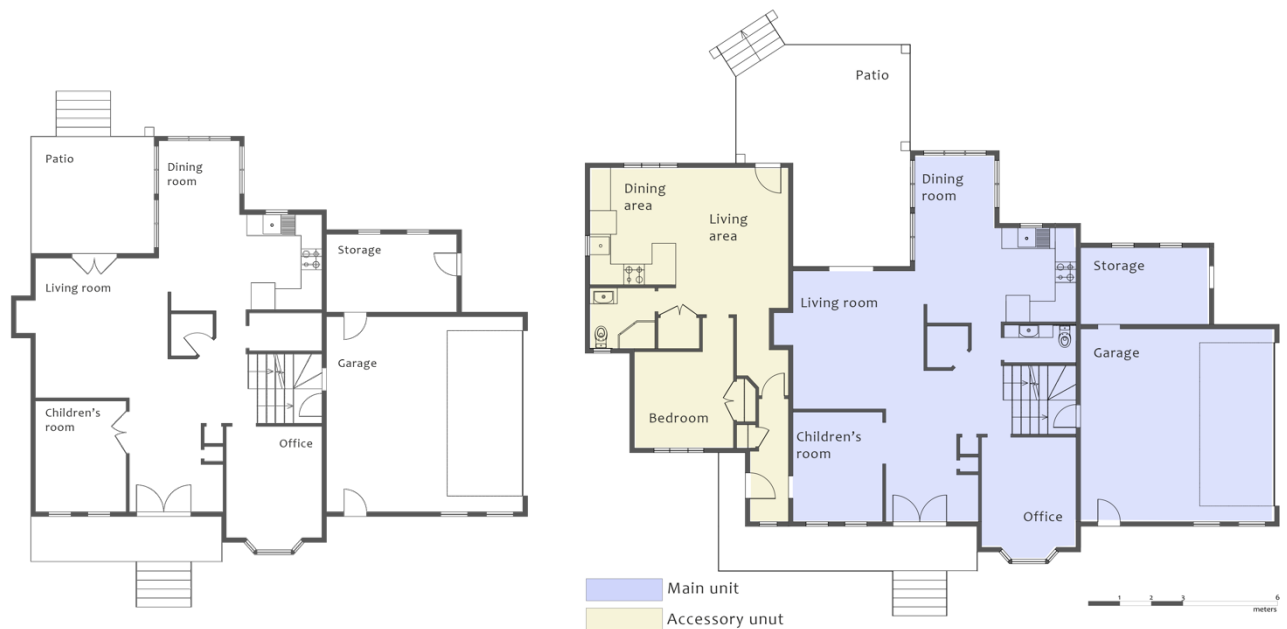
Plan of the first floor before (left) and after (right) the construction of the addition
